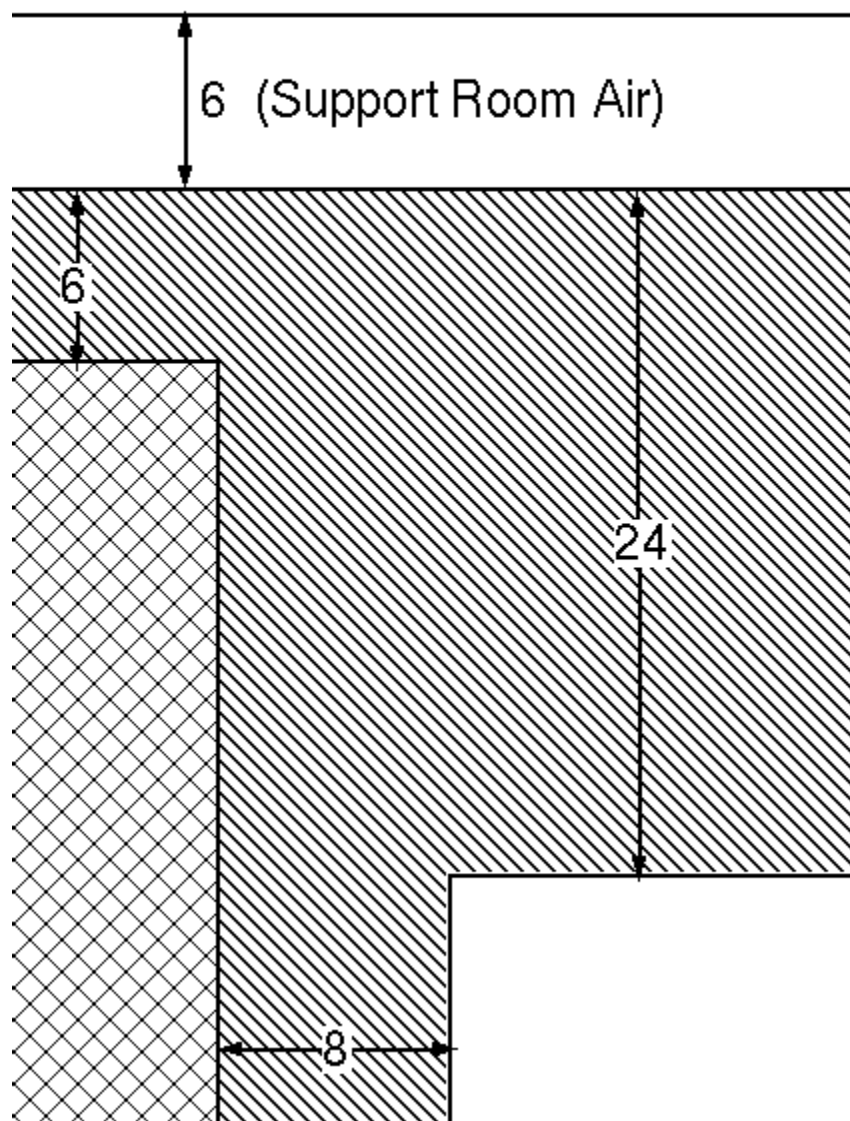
Detail of Figure 5, enlarging the top of the shaft, showing dimensions in inches.
